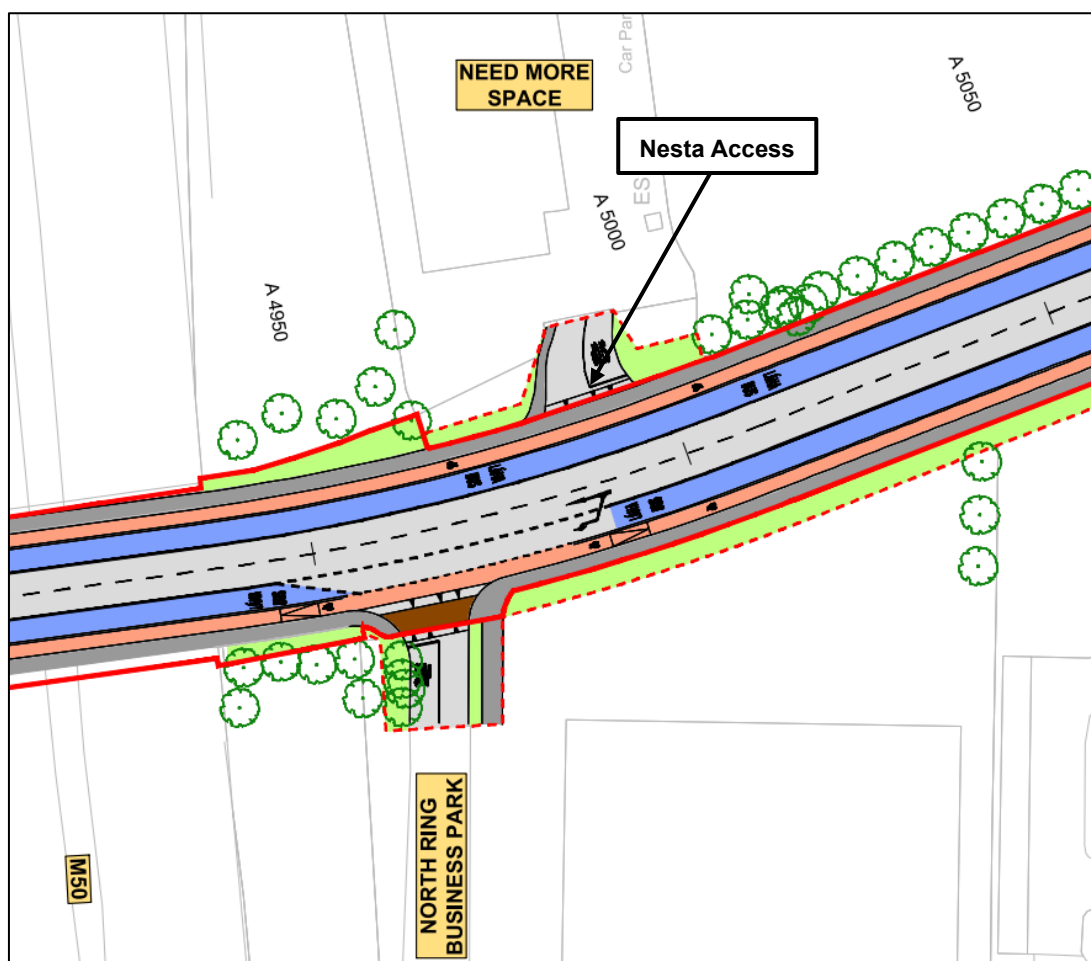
General Arrangement of Proposed Scheme at Nesta Storage (Sheet 14)
